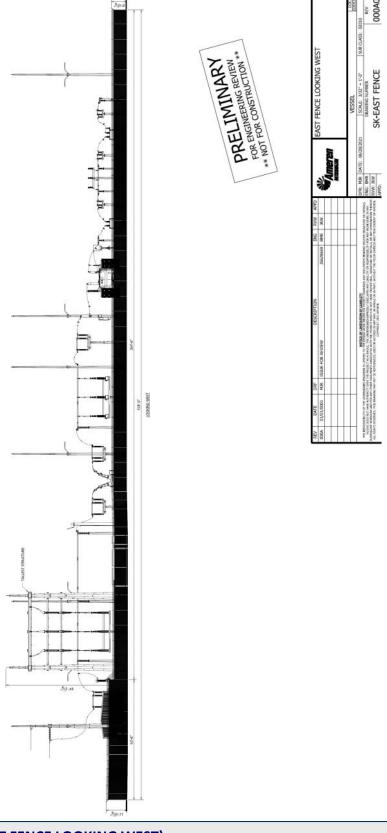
EXHIBIT C: SECTION VIEWS, 1 (EAST FENCE LOOKING WEST)
